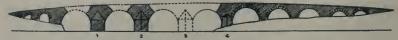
AESEPUS BRIDGE. SKETCH ELEVATION.
